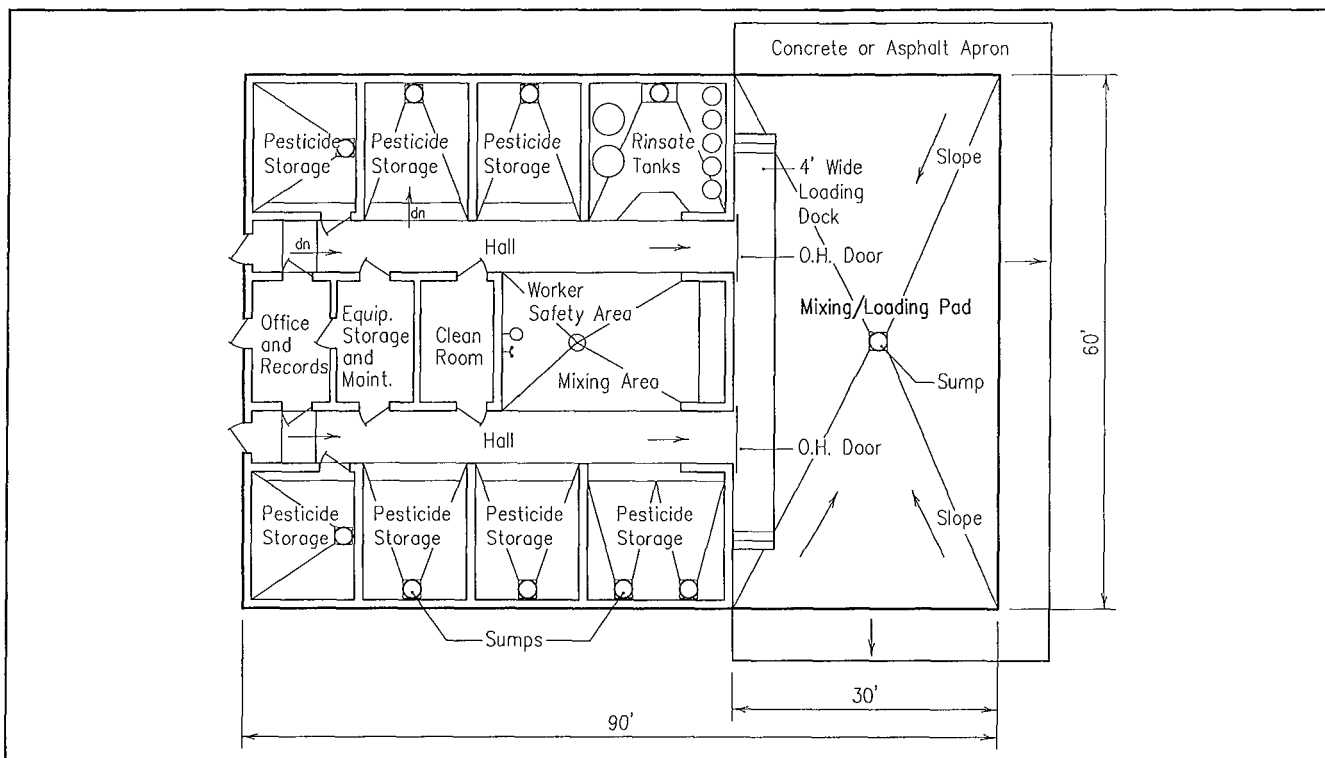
Experimental farm facility pesticide storage/lab building with loading pad.
